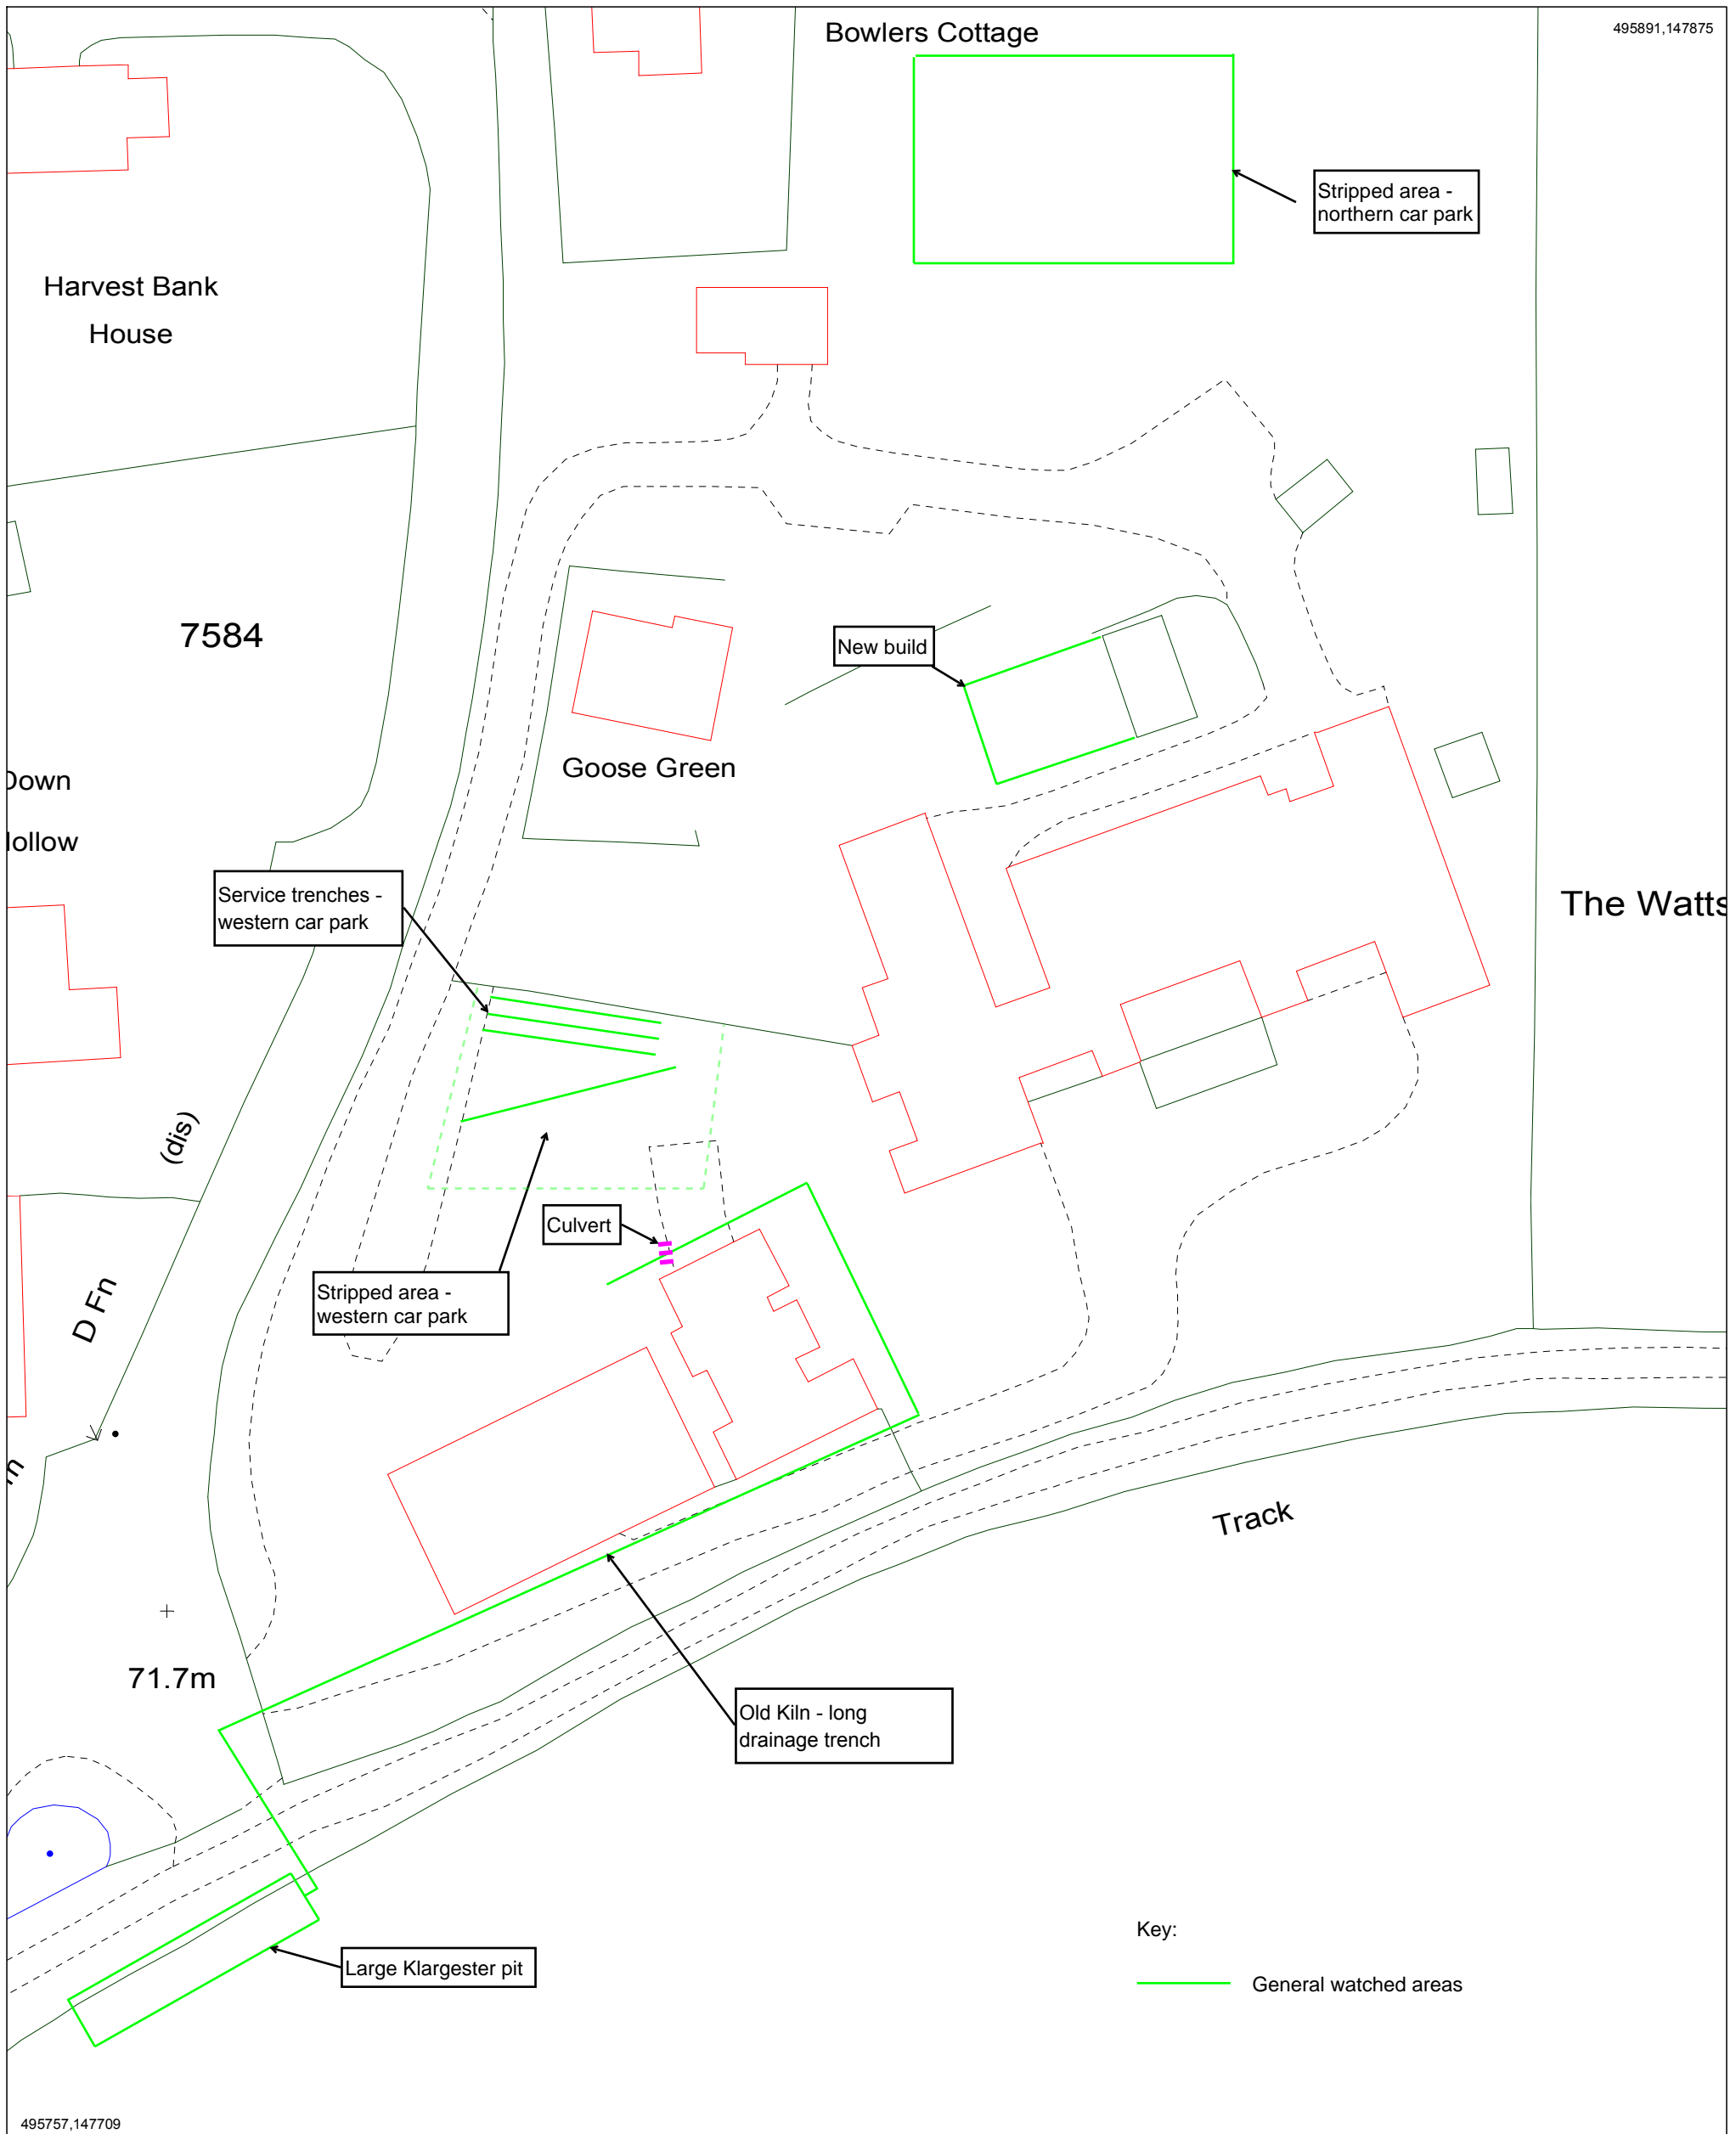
Plan of site showing watched service and drainage trenches, large Klargestester pit and position of new build
